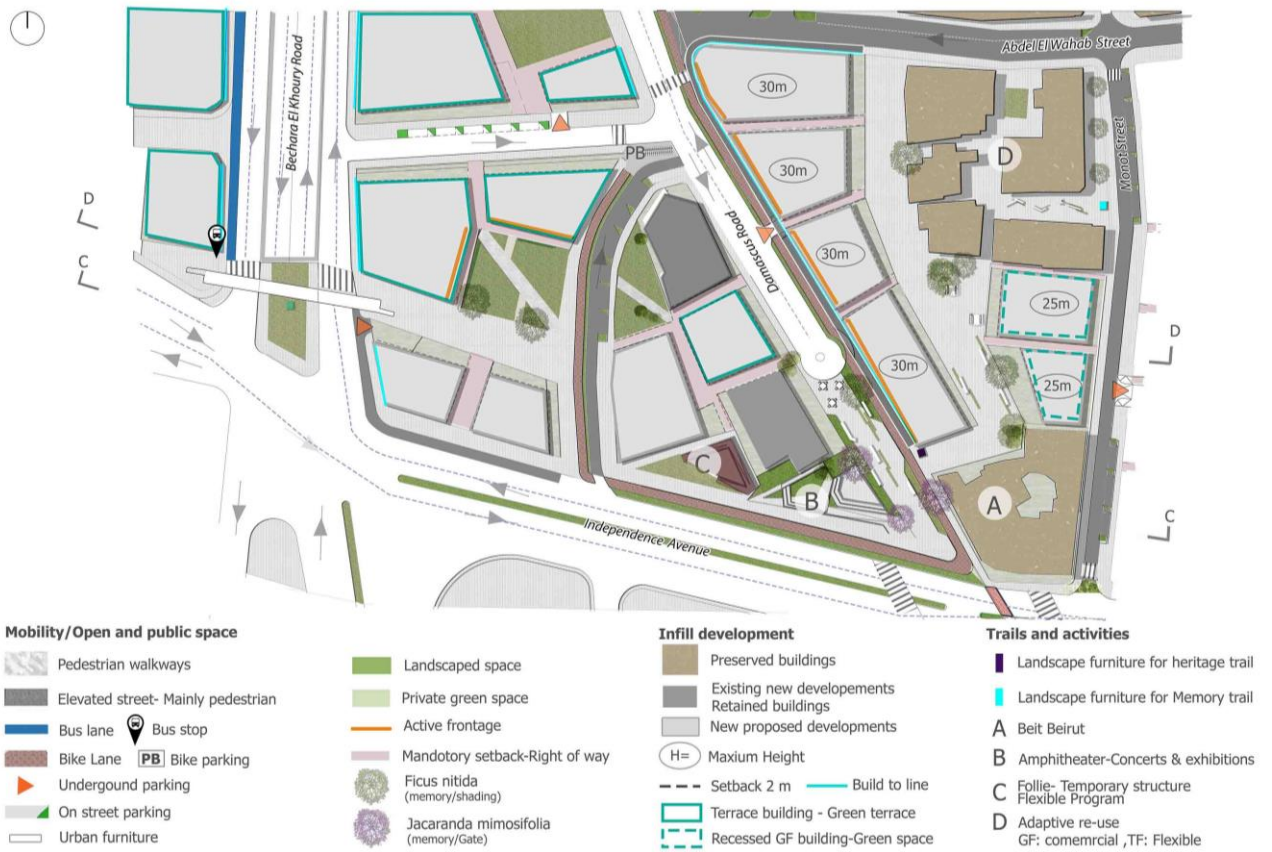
Urban Design plan of Zone D and E: The South Gate and the Conservation Area sectors (Source: Author, 2020)
